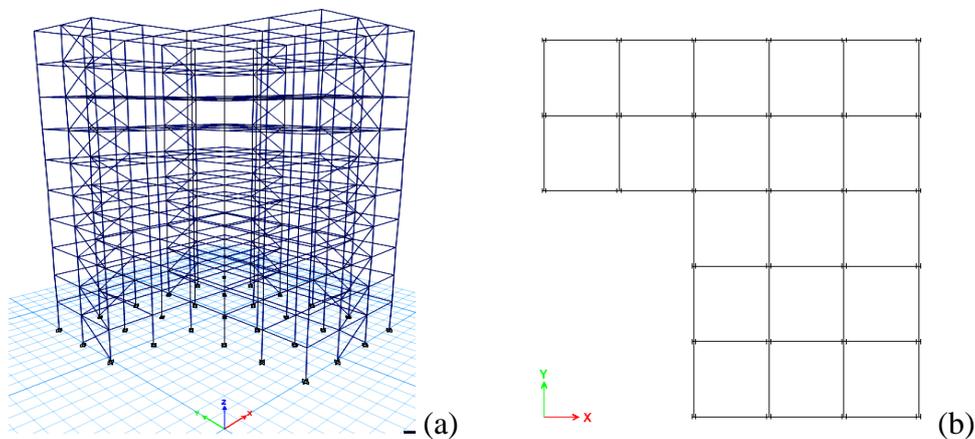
Model for plan irregular concentrically braced steel frame: (a) 3D; and (b) floor plan
